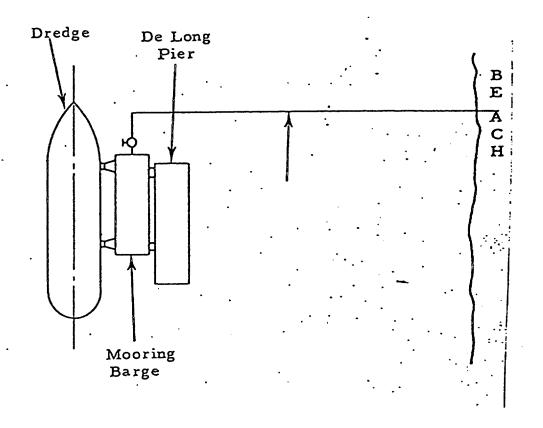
Schematic Plan View of System for Beach Nourishment with a Hopper Dredge (Adapted from Norfolk District, 1976)
